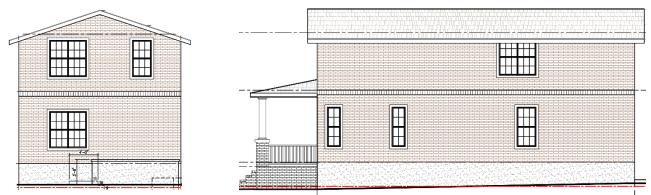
Rear (left) and East (right) Elevations of Proposed Dwelling
